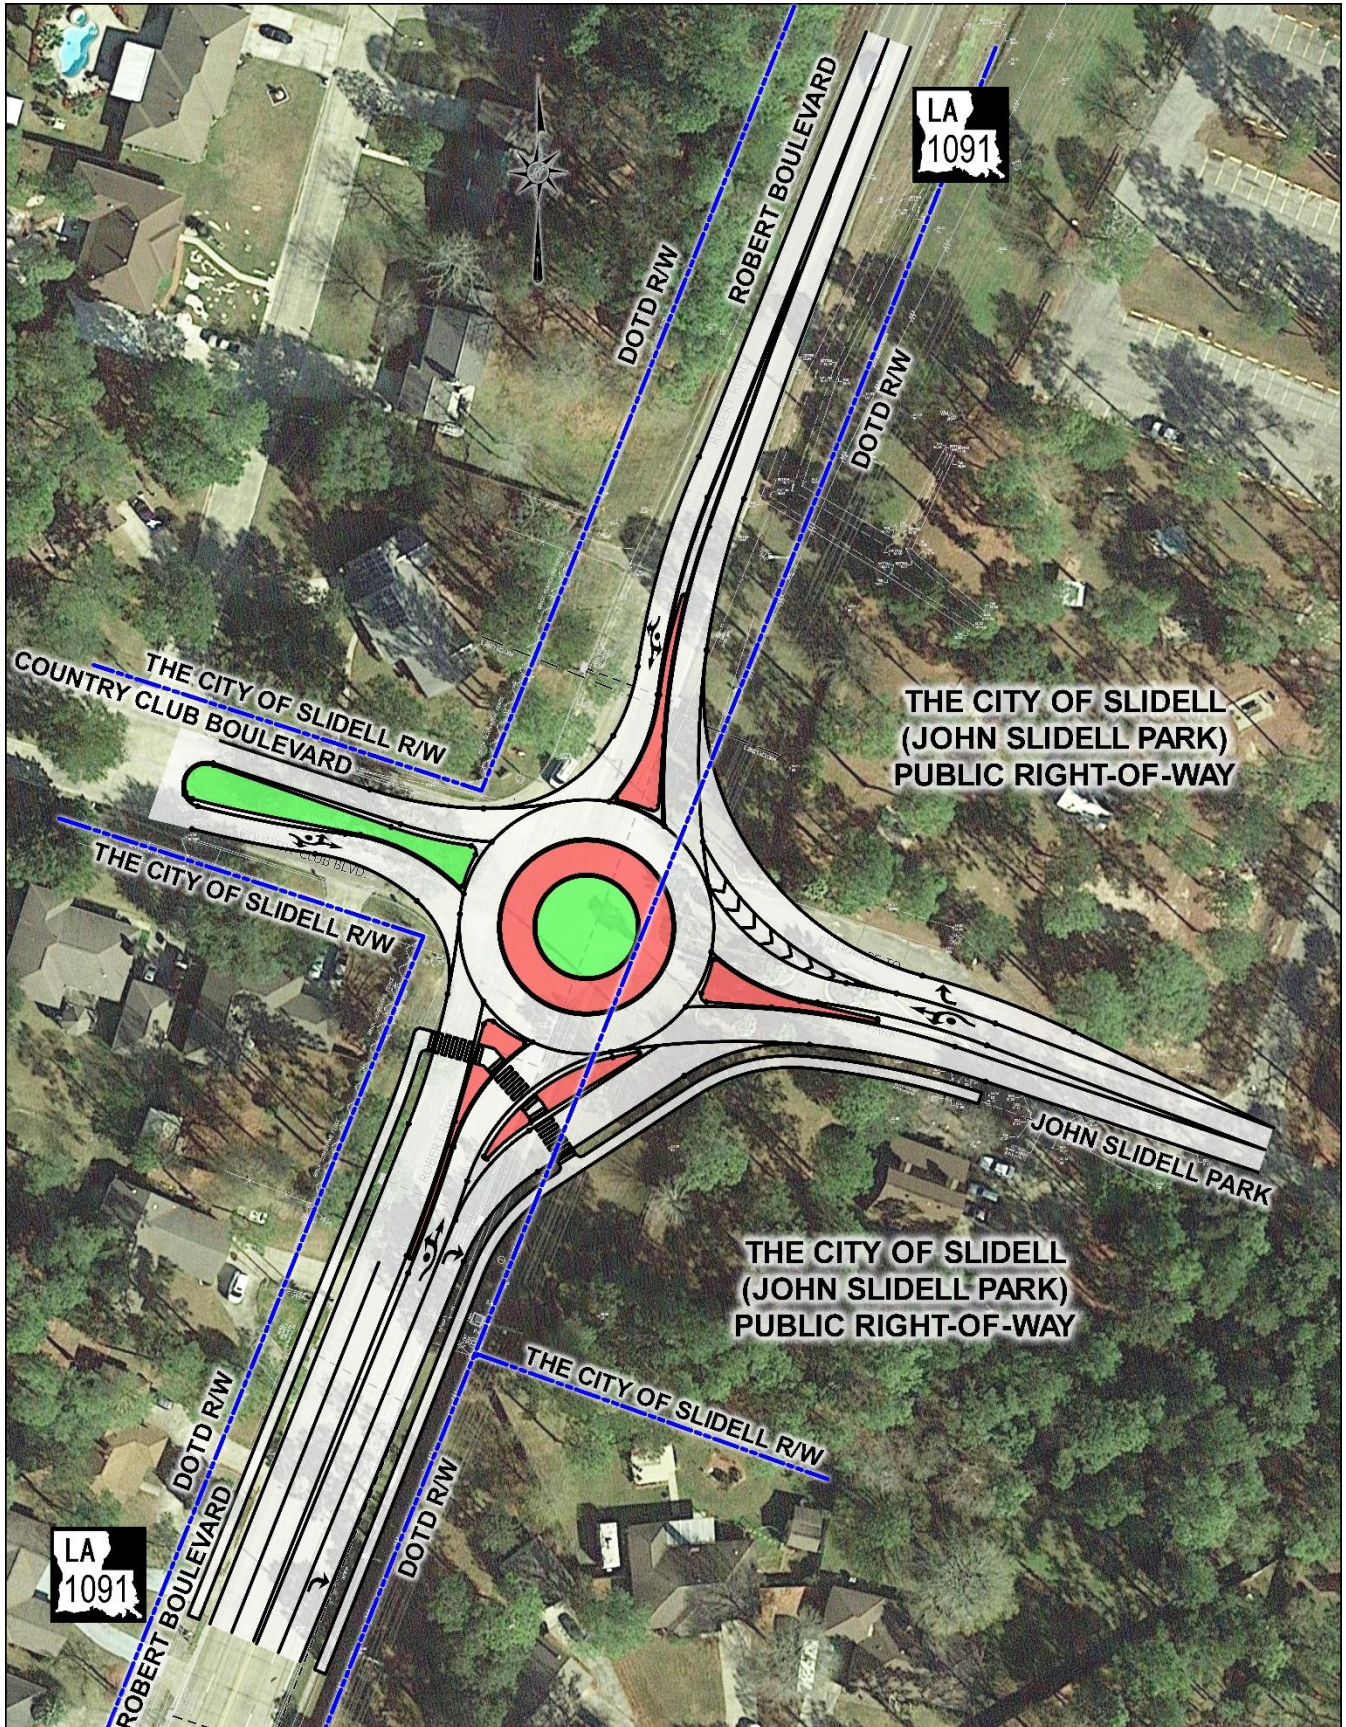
CONCEPTUAL ROUNDABOUT LAYOUT DESIGN
